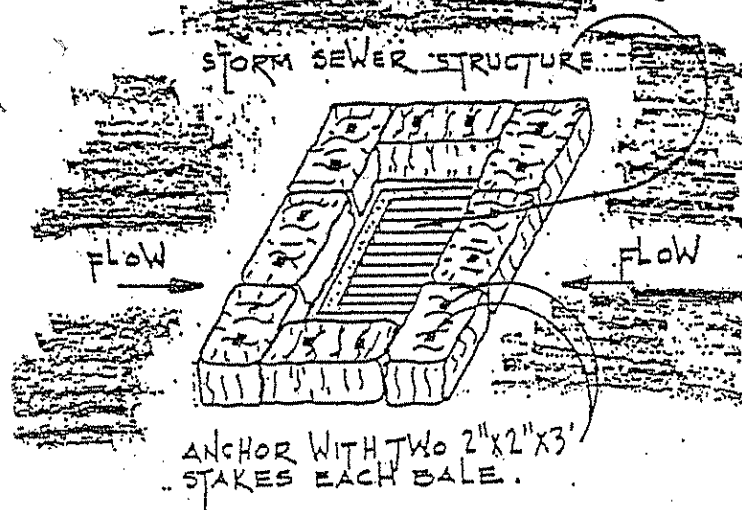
Placement and Construction of a Straw Bale Barrier.
